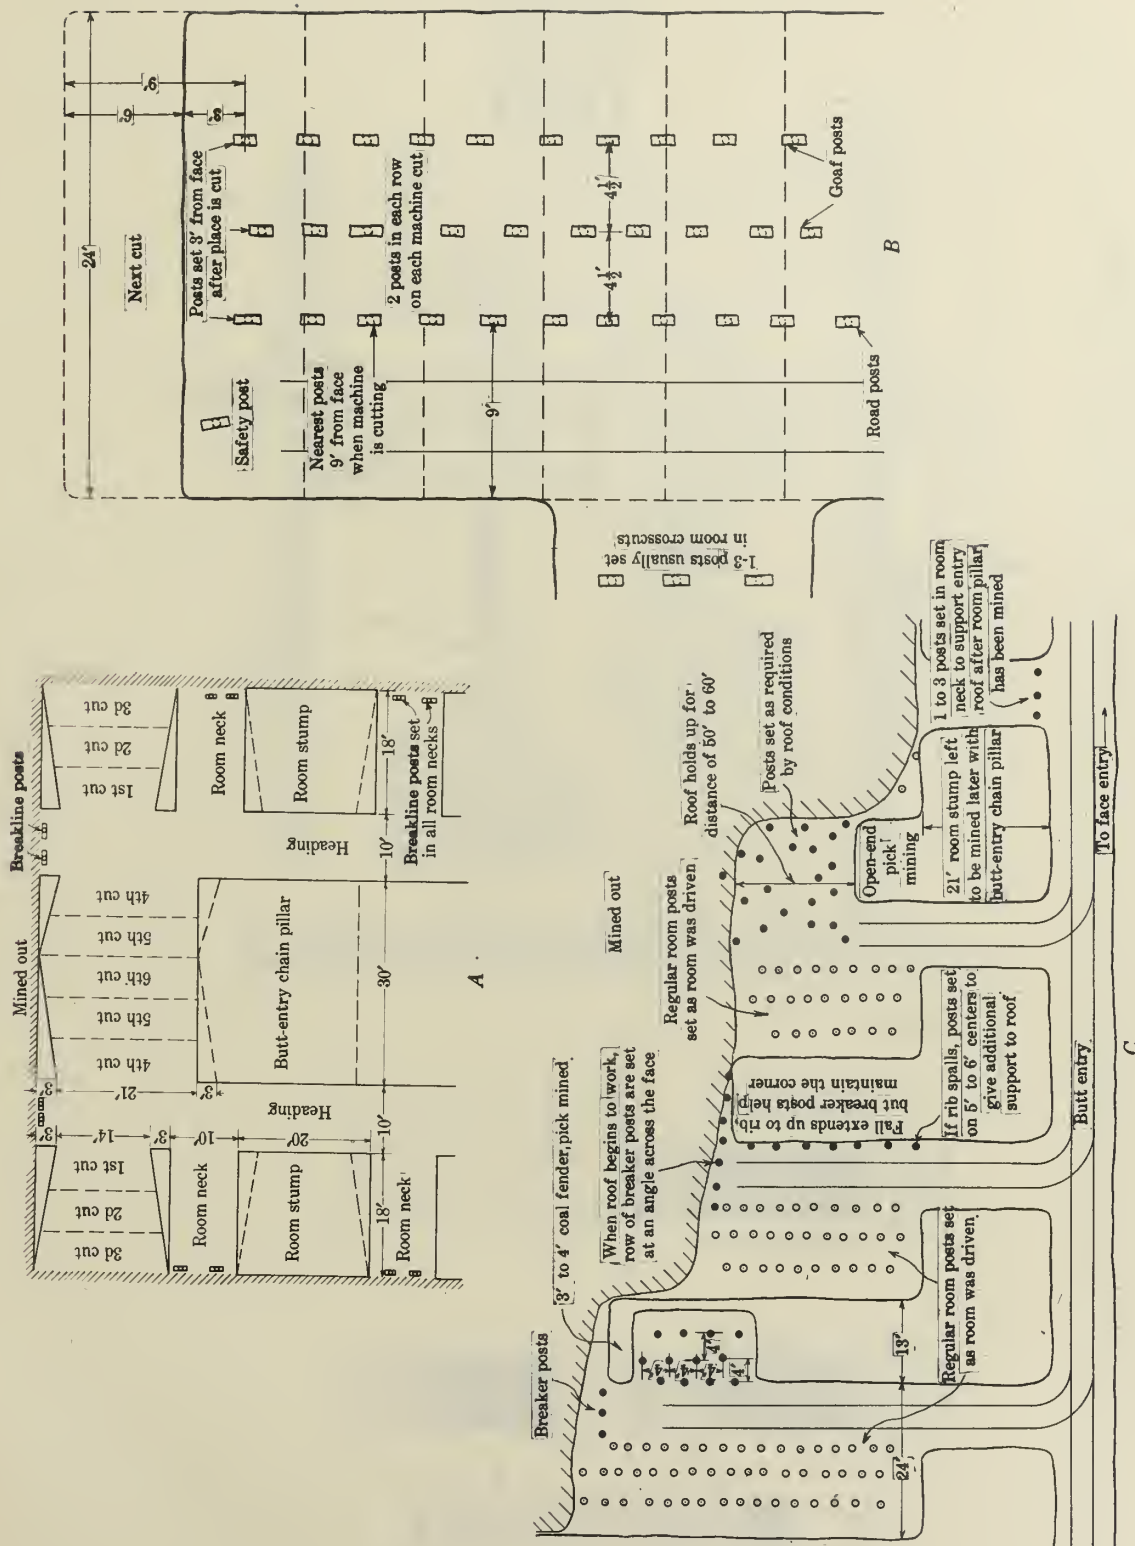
Details of pillar extraction, and timbering in pillar work, type B mines: A, Plan of recovering butt-entry chain pillars and room stumps; B, plan of room timbering; C, plan of rooms showing methods of pillar extraction and timbering in pillar places.
